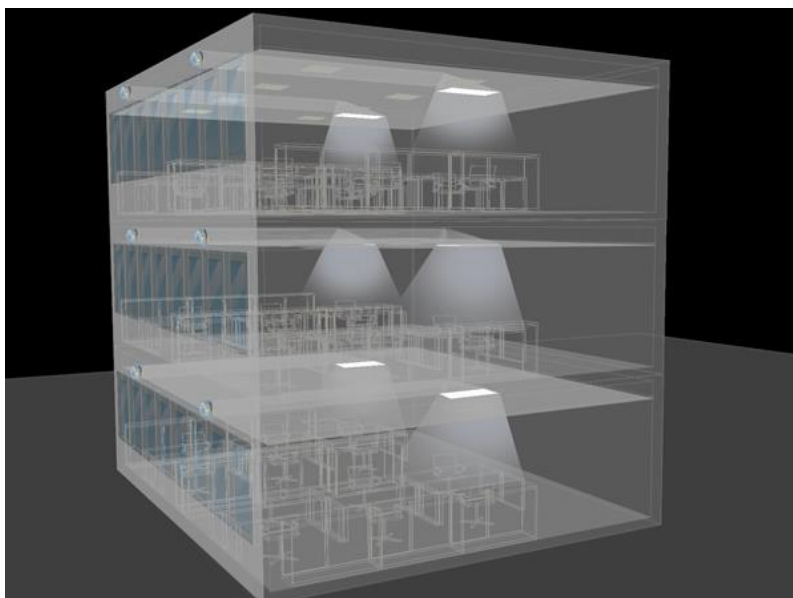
illustration of HLP applicability in a multilevel office building with application on a south oriented façade.
